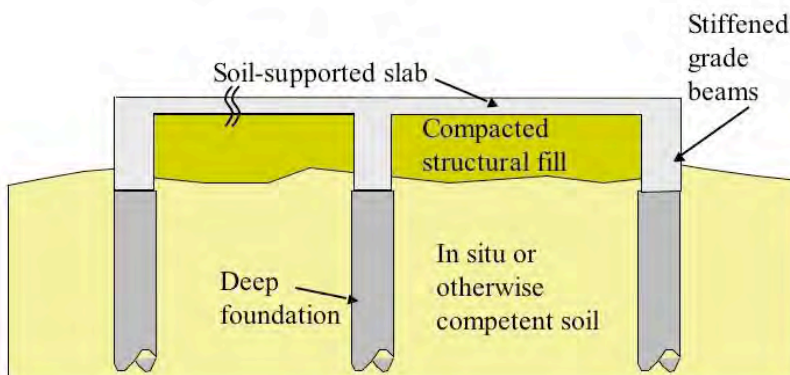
Stiffened Non-Structural Slab on Fill with Deep Foundations
